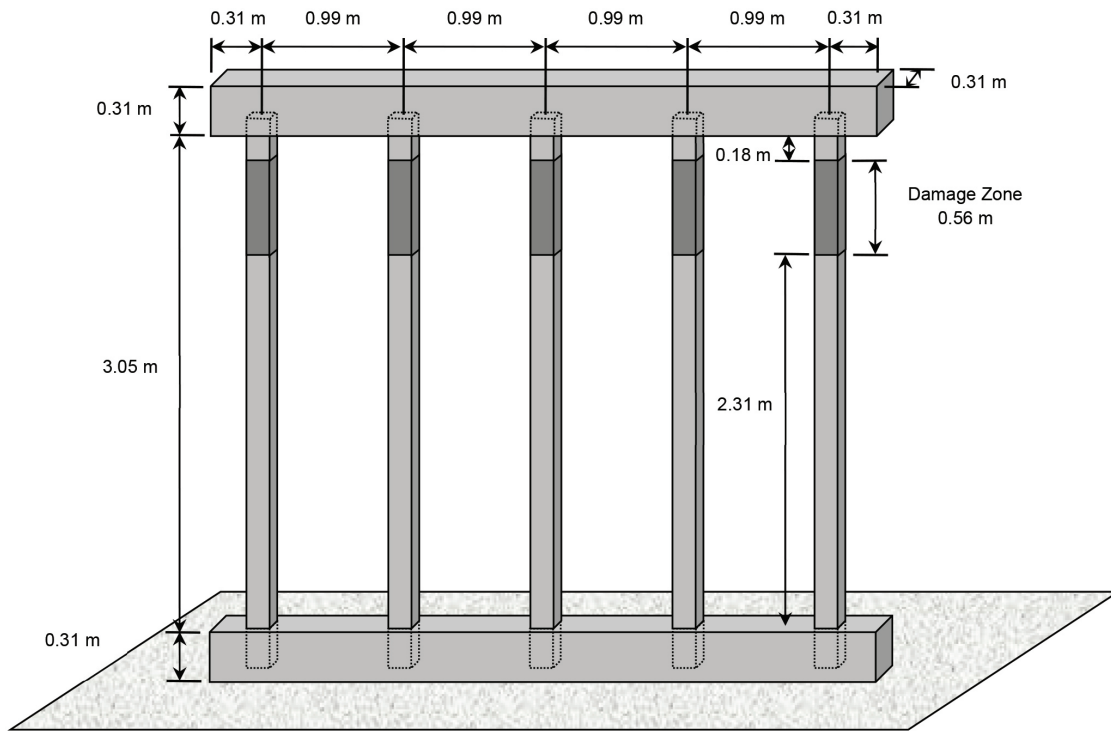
Model pile bent layout. Note: 1 m = 3.281 ft.
